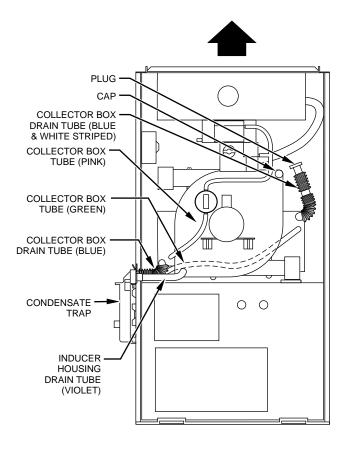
Factory-Shipped Upflow Tube Configuration (Shown With Blower Access Panel Removed)
